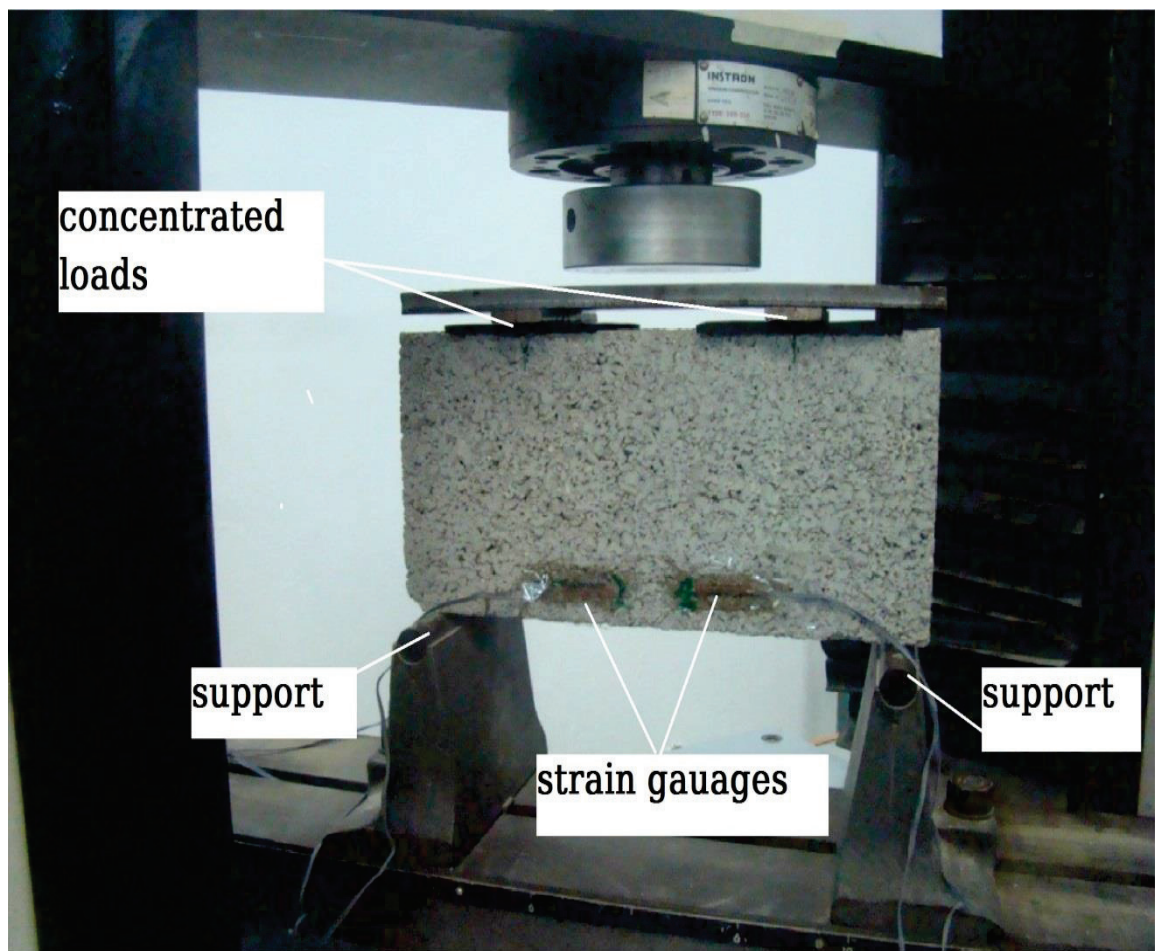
Loading-unloading test for concrete masonry block under tension
